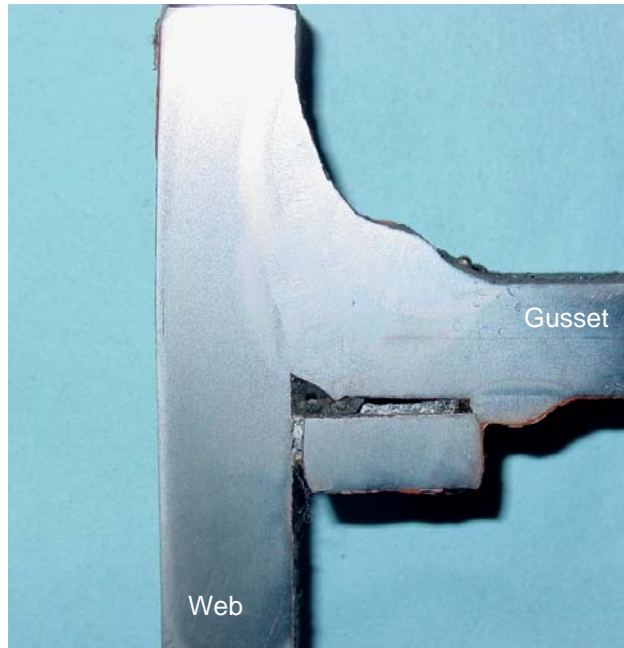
Cross-section of Weld Joining the Gusset Plate to the Girder Web Showing Incomplete Root Fusion and Attendant Root Discontinuities.
